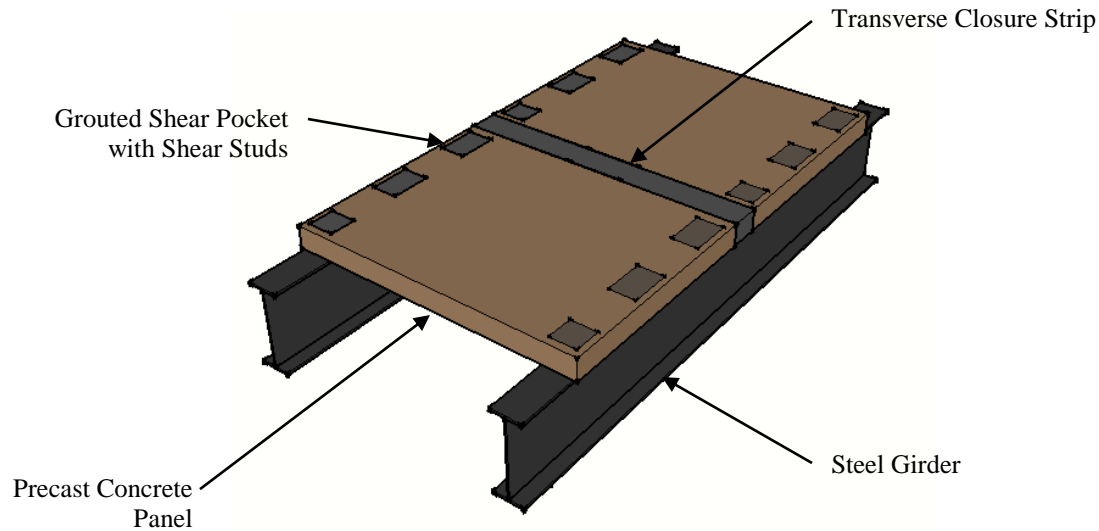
Precast Deck Panels Shear Connected to Steel Girders
